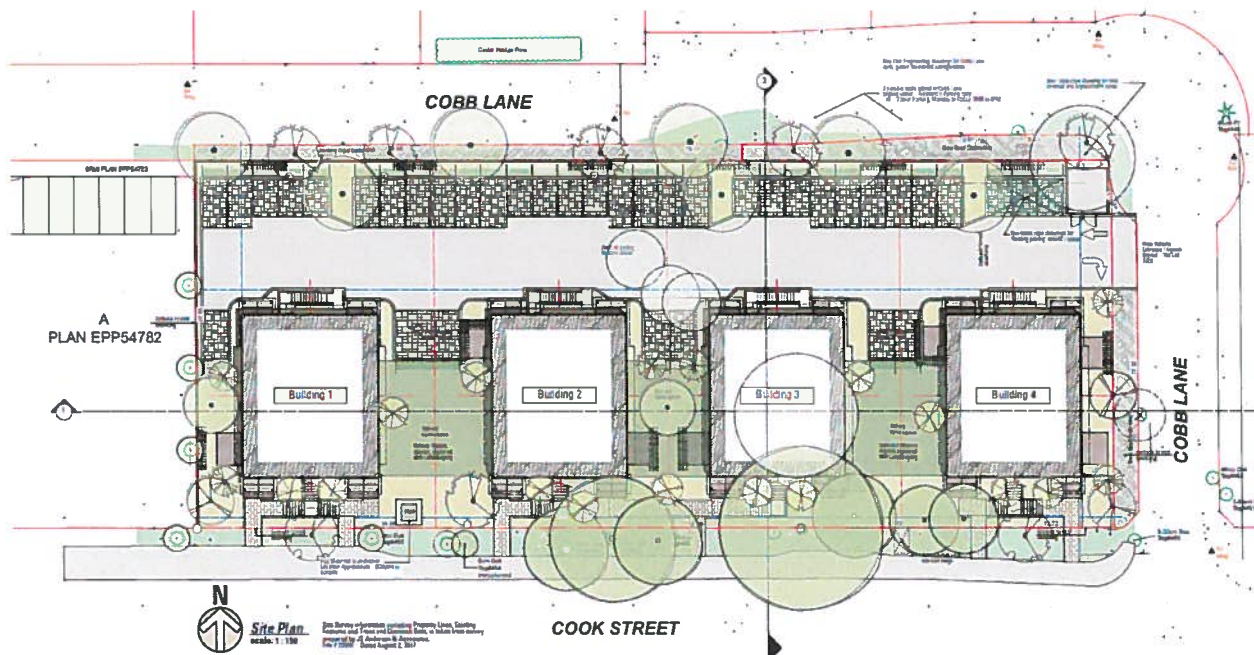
Site Plan (from Joe Newell Architect Inc.)
